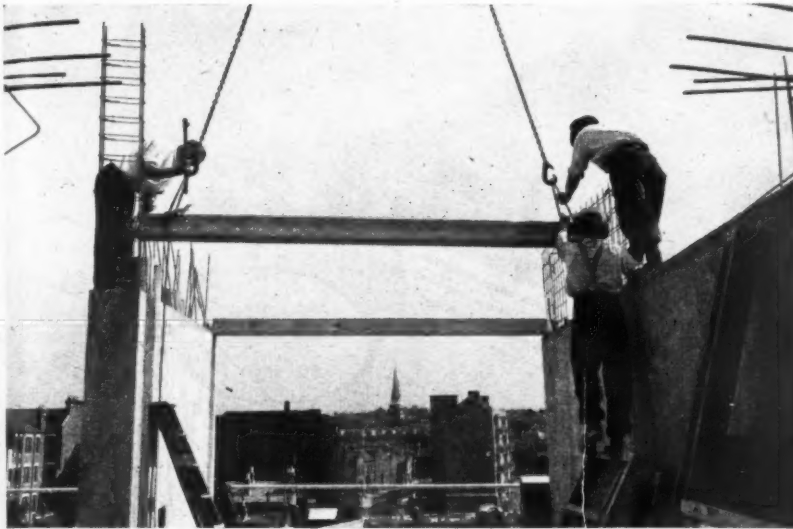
Placing precast beams to receive timber floors. Holes in beams are for electrical wiring.
